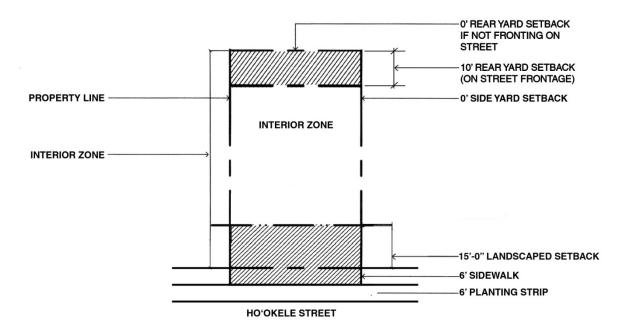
Typical Hoʻokele Street Lot Diagram (Building Setbacks)
